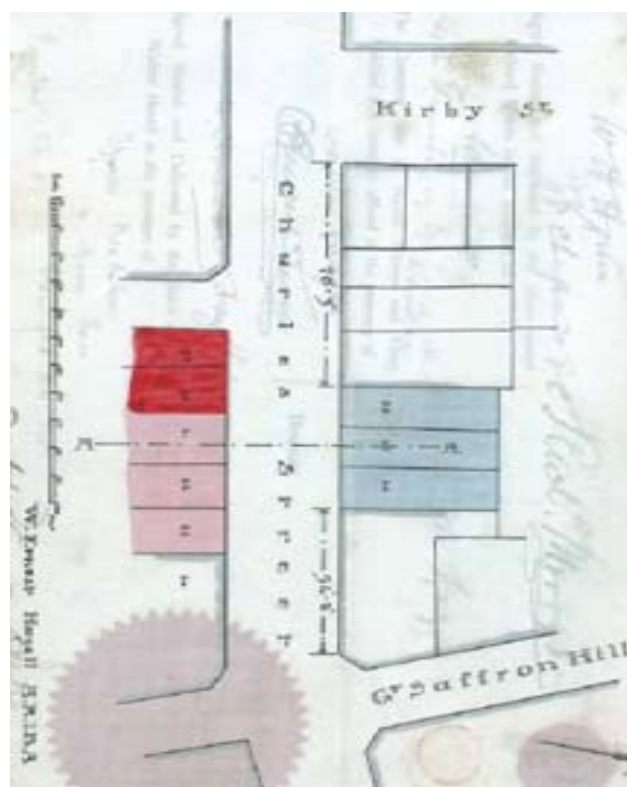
W. Ernest Hazel, Site Plan of Charles Street, 1900.
